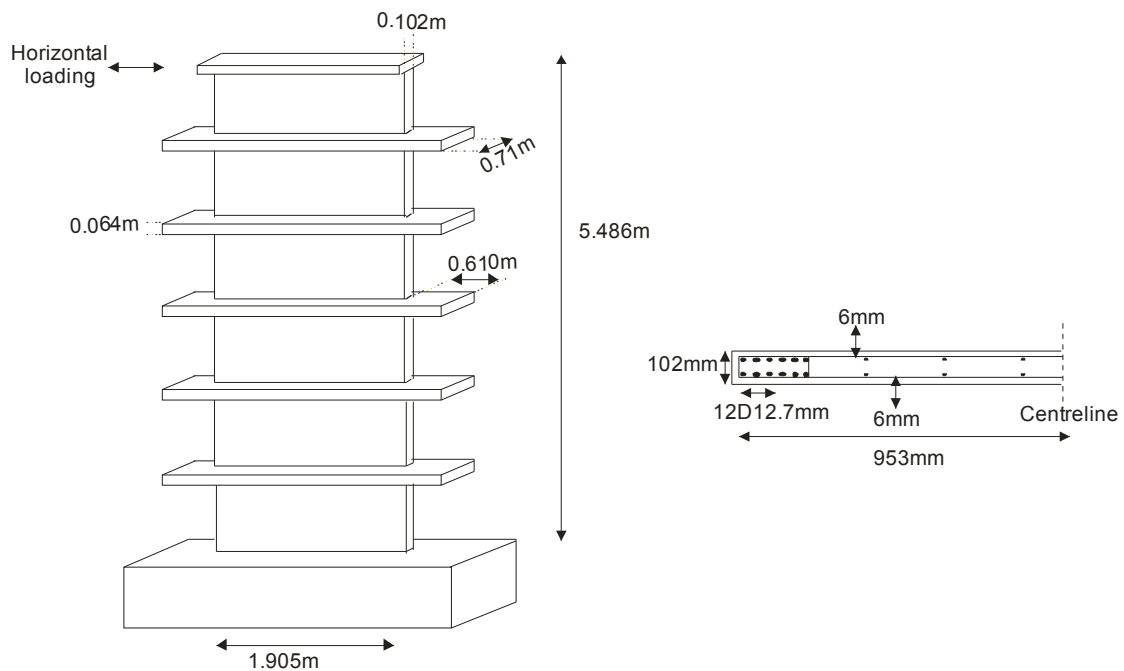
Wall geometry and reinforcing details for Shiu, S1
